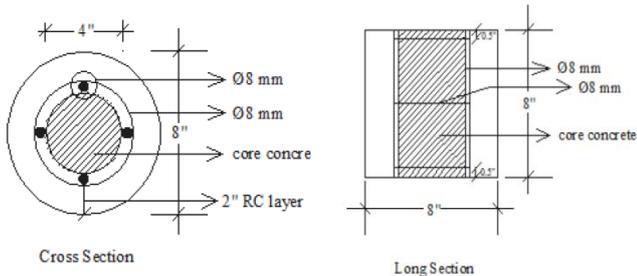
Detailing of the Section (Retrofitted by RC jacketing) [13].
